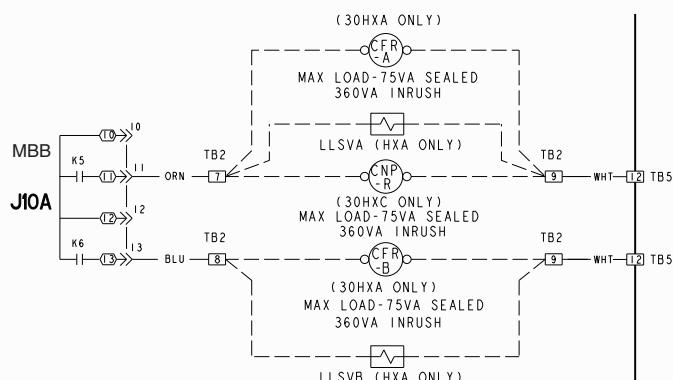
Condenser Pump Relay Wiring; 30HXC and Remote Condenser Fan/Liquid Line Solenoid Valve Wiring; 30HXA 115 or 230 V\
